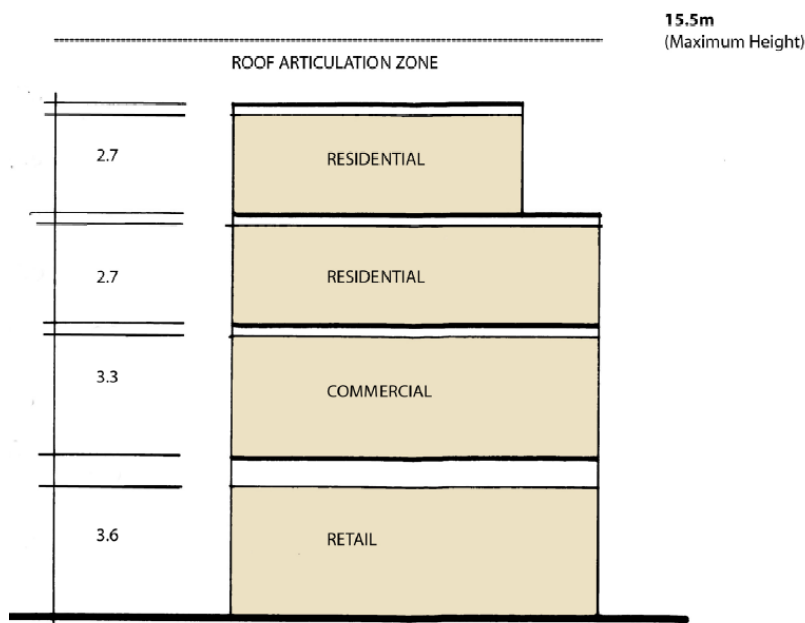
Floor to ceiling height control for development in Victoria Road West Precinct (Part 4.3 of RDCP 2014)
